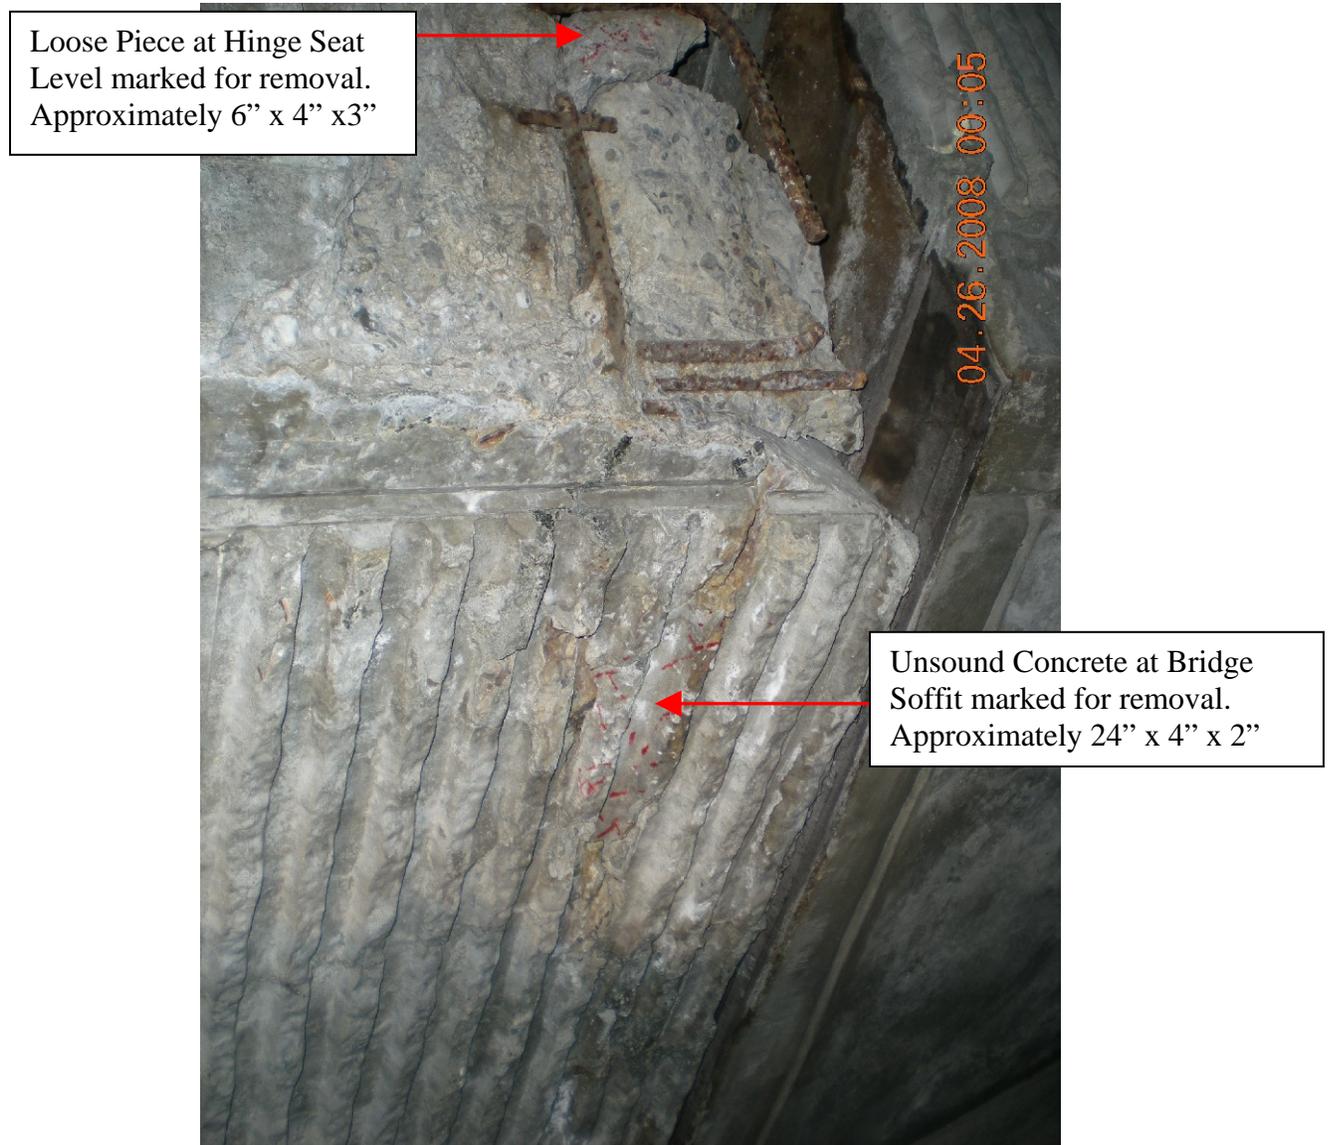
“Before” Photo of Two Concrete Pieces Identified for Removal at Location 1
